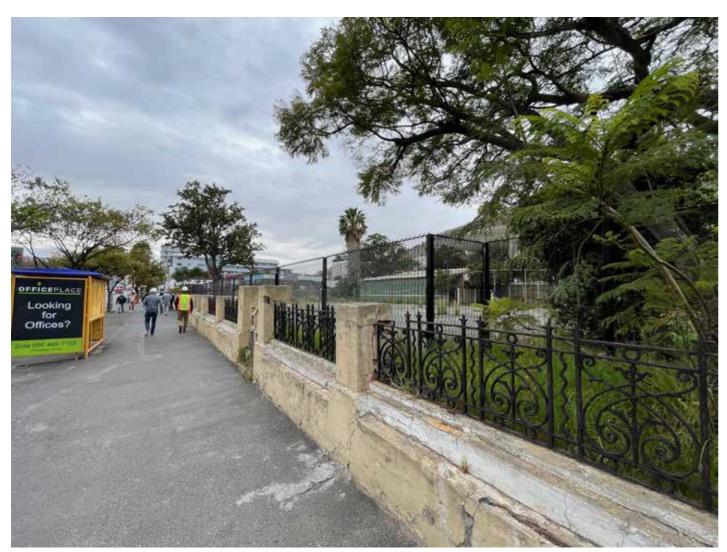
Site boundary walls, Main Road and Herbert Road. (RSA 2023)
